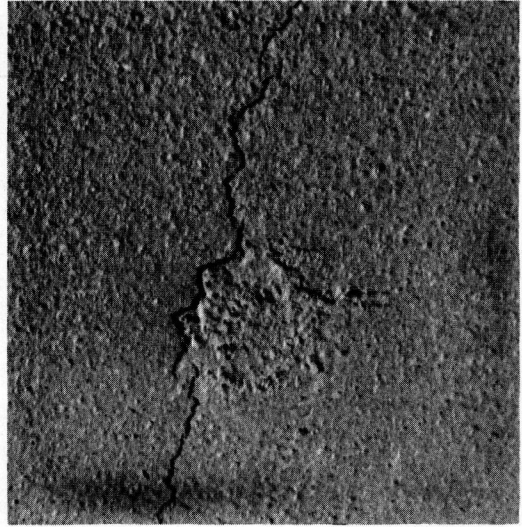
Shrinkage crack adjacent to sand-cement lump.
